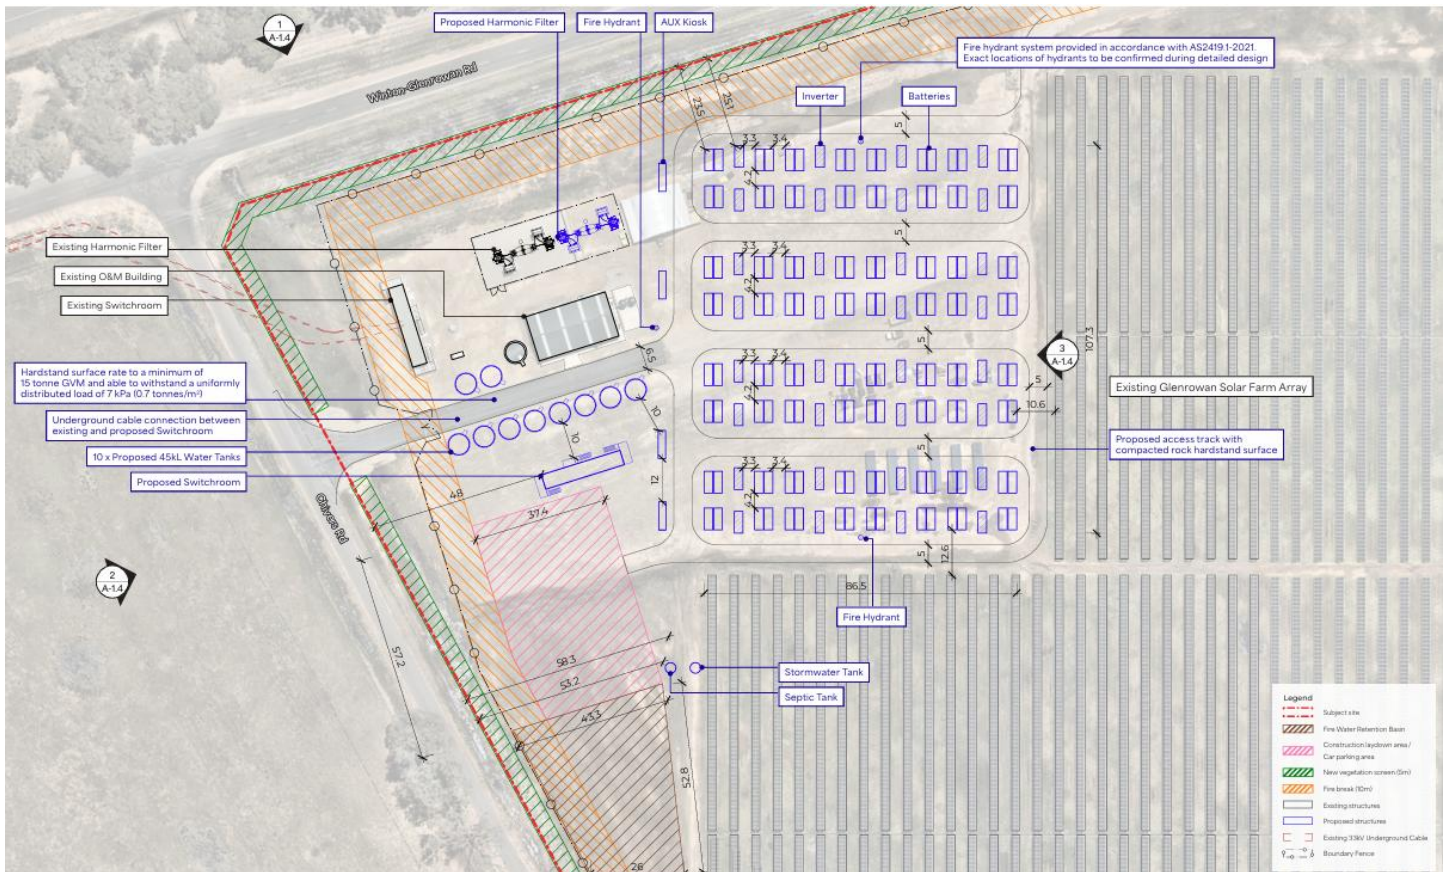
Proposed BESS layout and adjoining Glenrowan Solar Farm. Source: Development Plans, prepared by Ethos Urban
